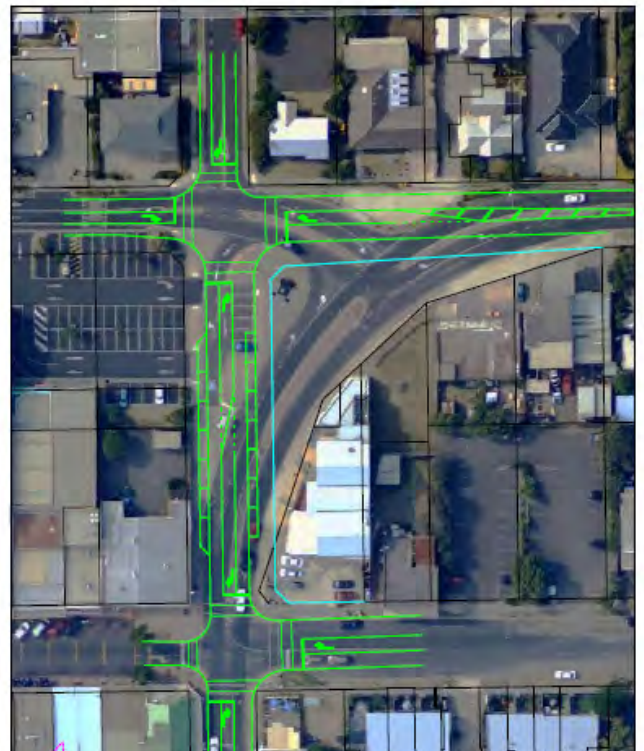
Possible intersection layout at Hodgson Street and The Parade
